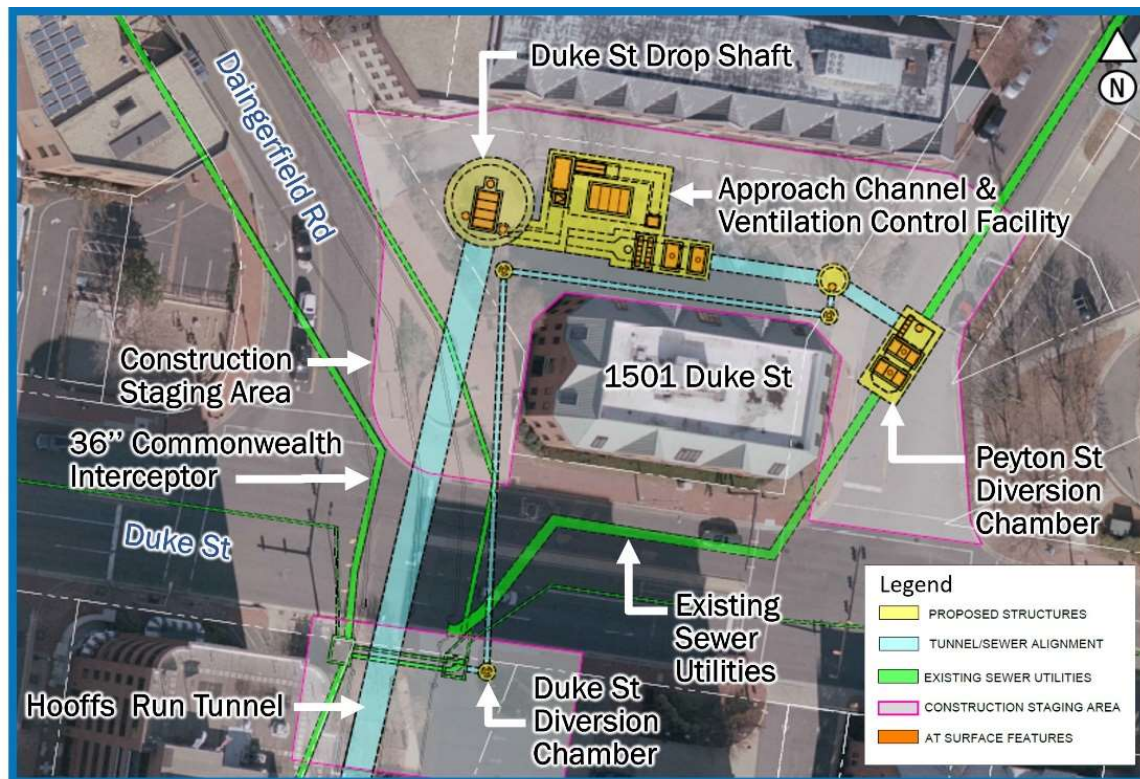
Hooffs Run Deep Tunnel and Diversion Facility near Duke Street
